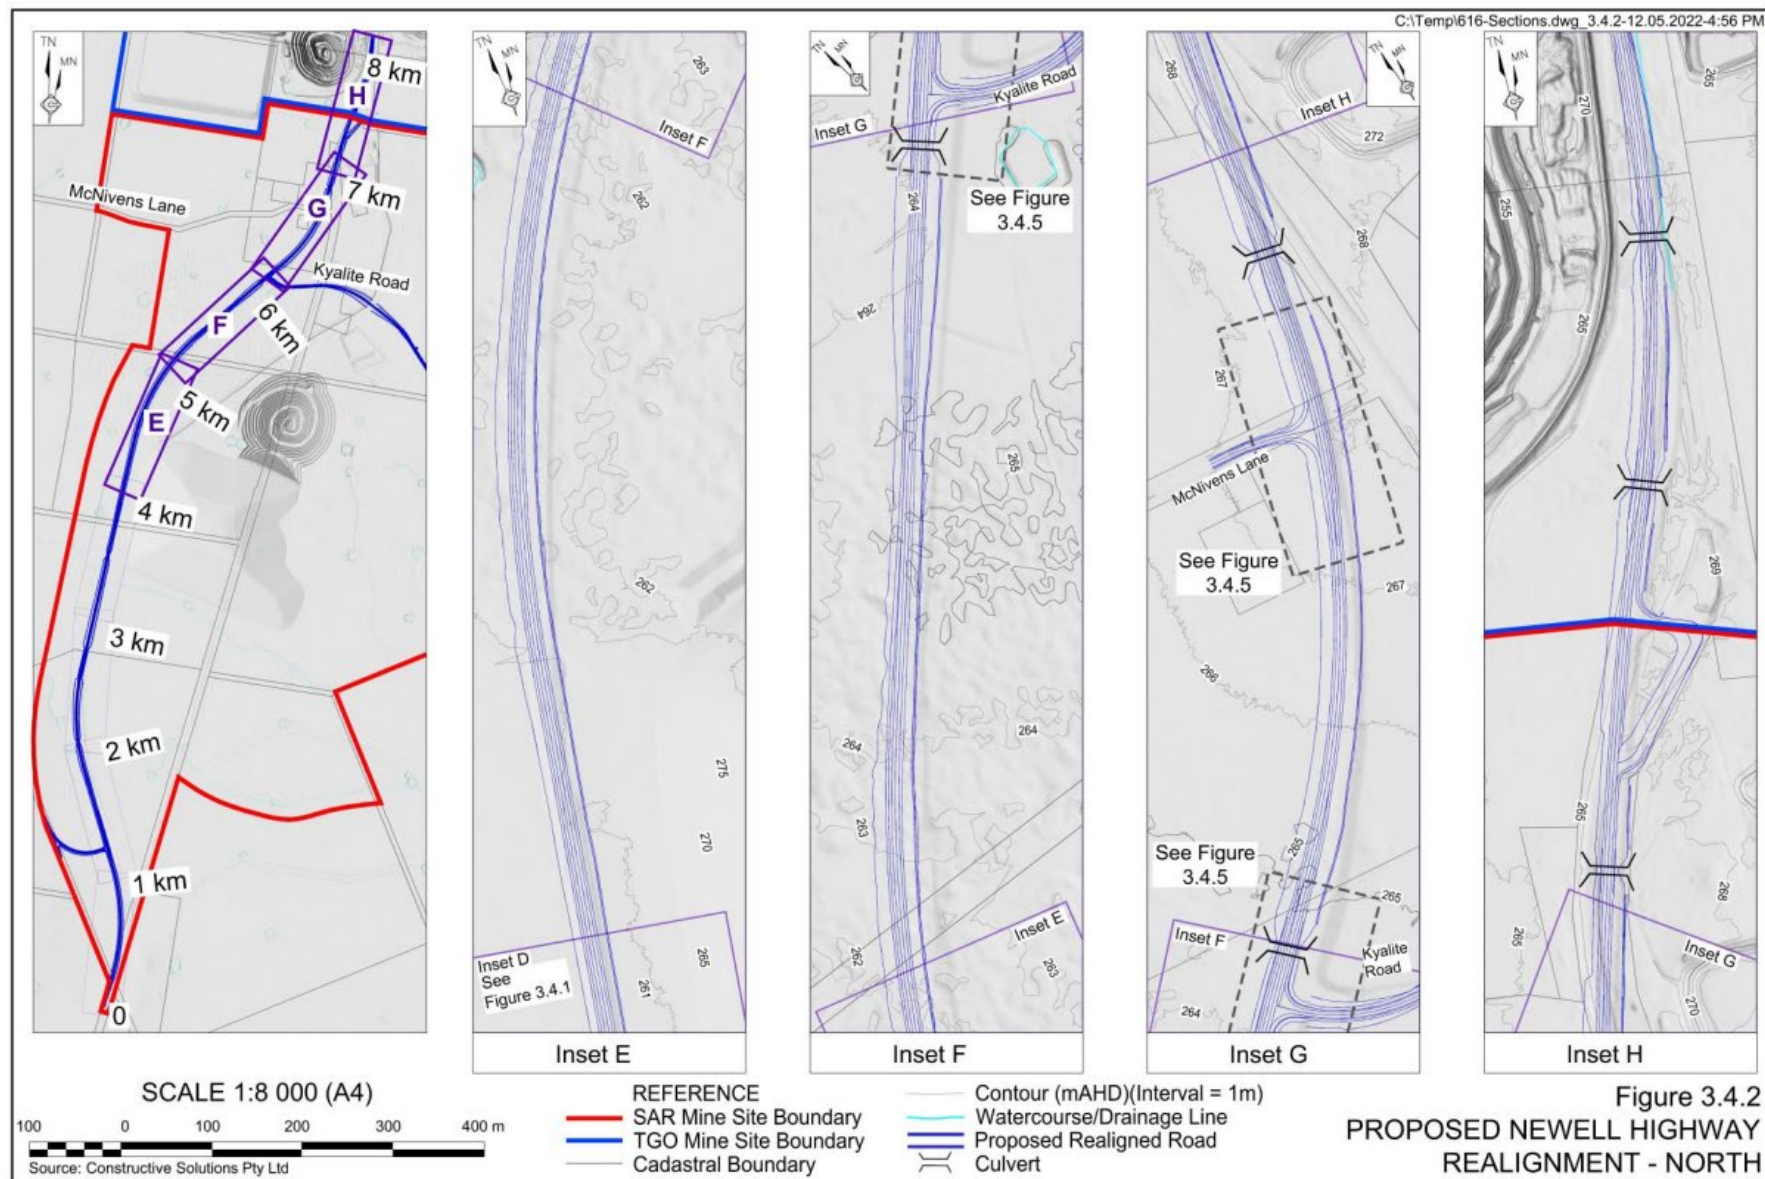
Newell Highway Realignment North Conceptual Development Layout
